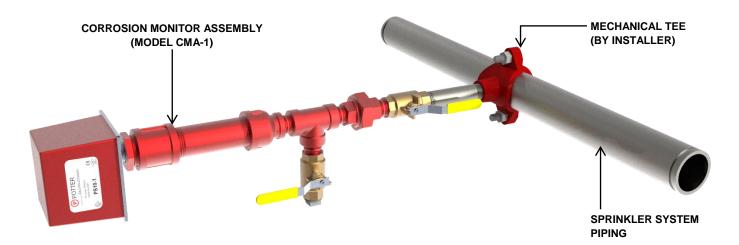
HORIZONTAL INSTALLATION (VERTICAL INSTALLATION NOT SHOWN)
